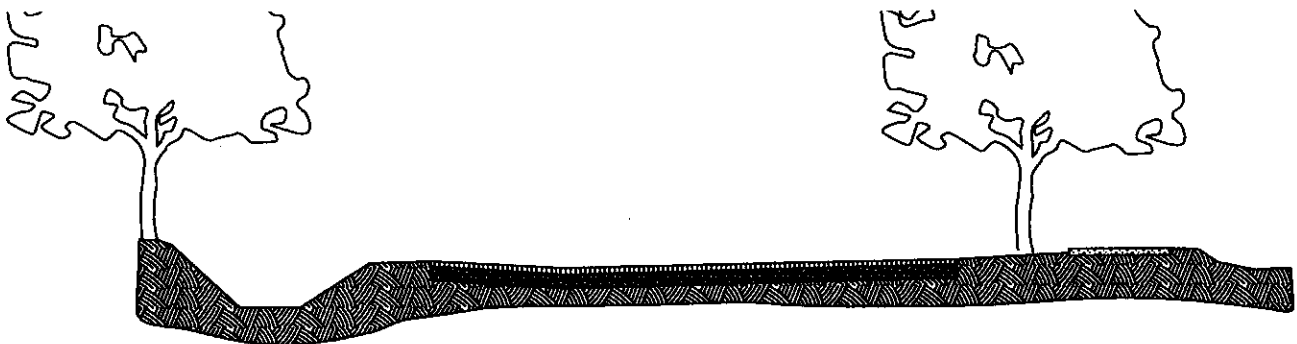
Street Design Option D - Valley Section with Swale Drainage
